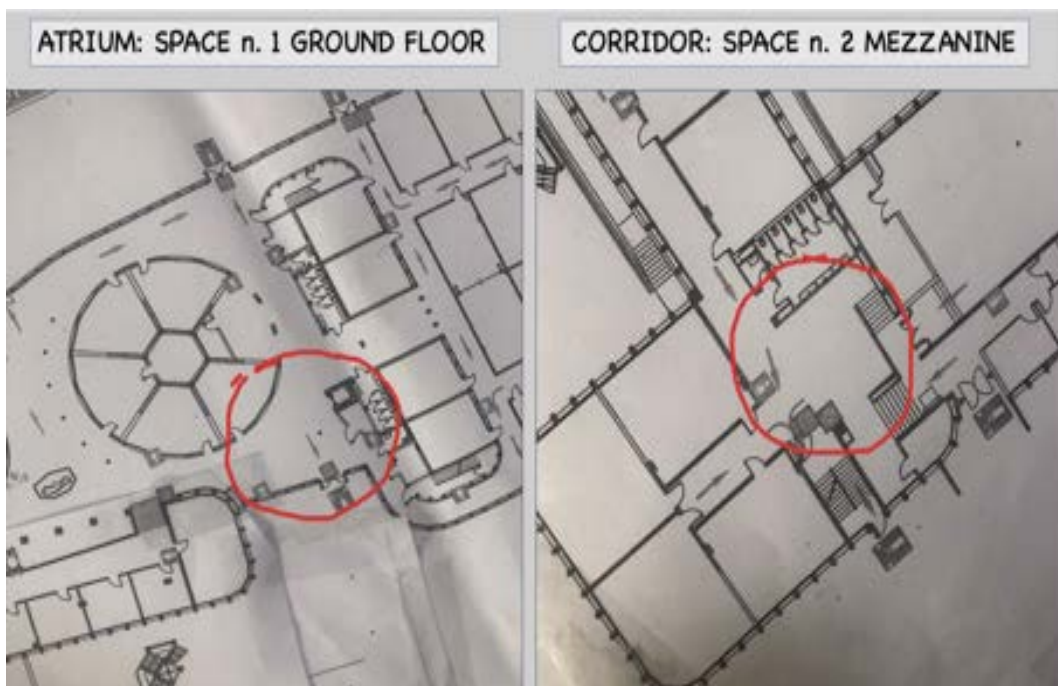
DETAIL OF THE SPACES TO REDESIGN. SPACE N. 1: ATRIUM – GROUND FLOOR; SPACE N. 2: CORRIDOR – MEZZANINE
